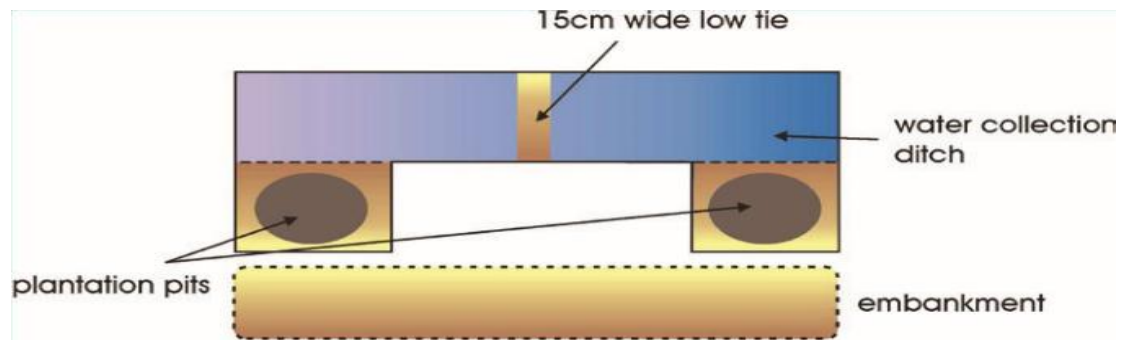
Top-view layout of a micro-trench showing paired plantation pits, central trench, 15cm tie, and downstream embankment.
